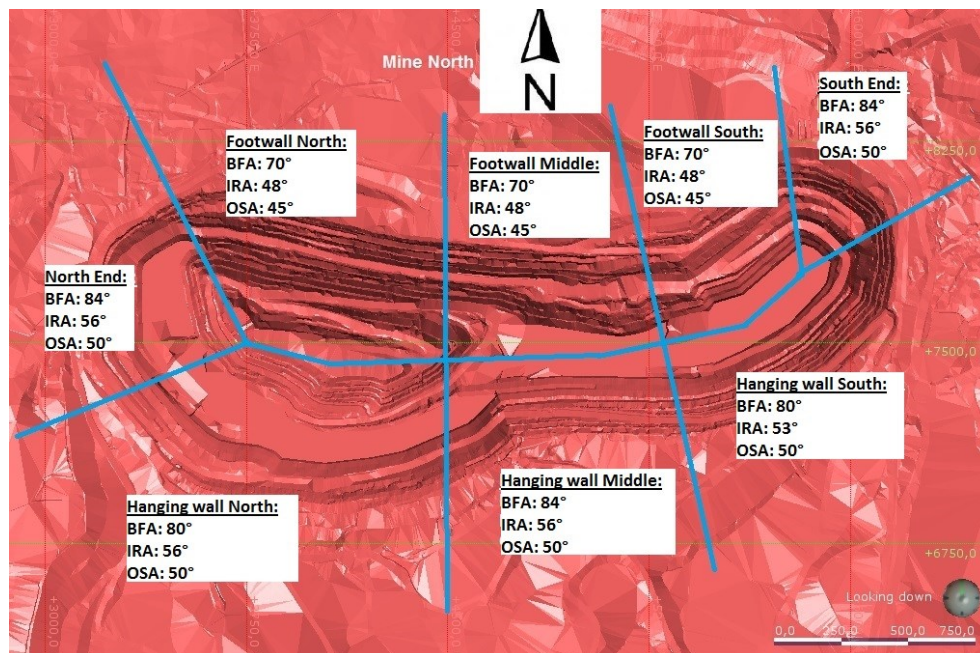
Design sectors with bench face, interramp and overall slope angles in Aitik after (Sjöberg, et al. 2016).
